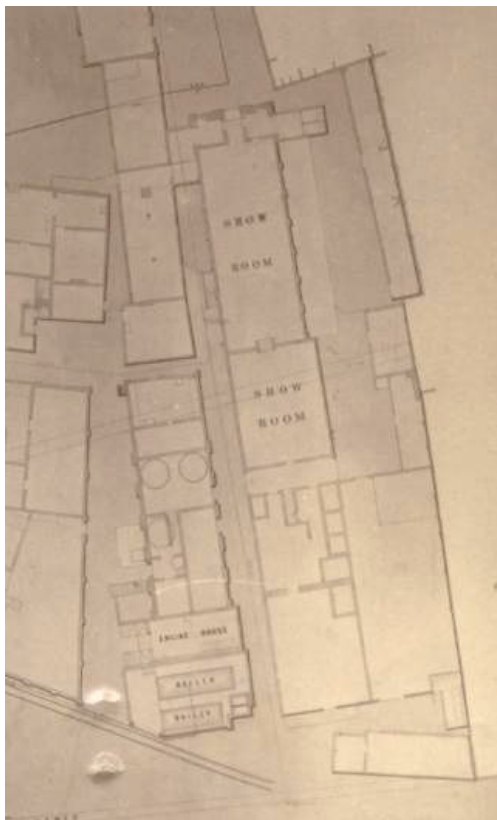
Plan of c1885 showing the new lower showroom in Building A (source: Worcester Porcelain Museum)
